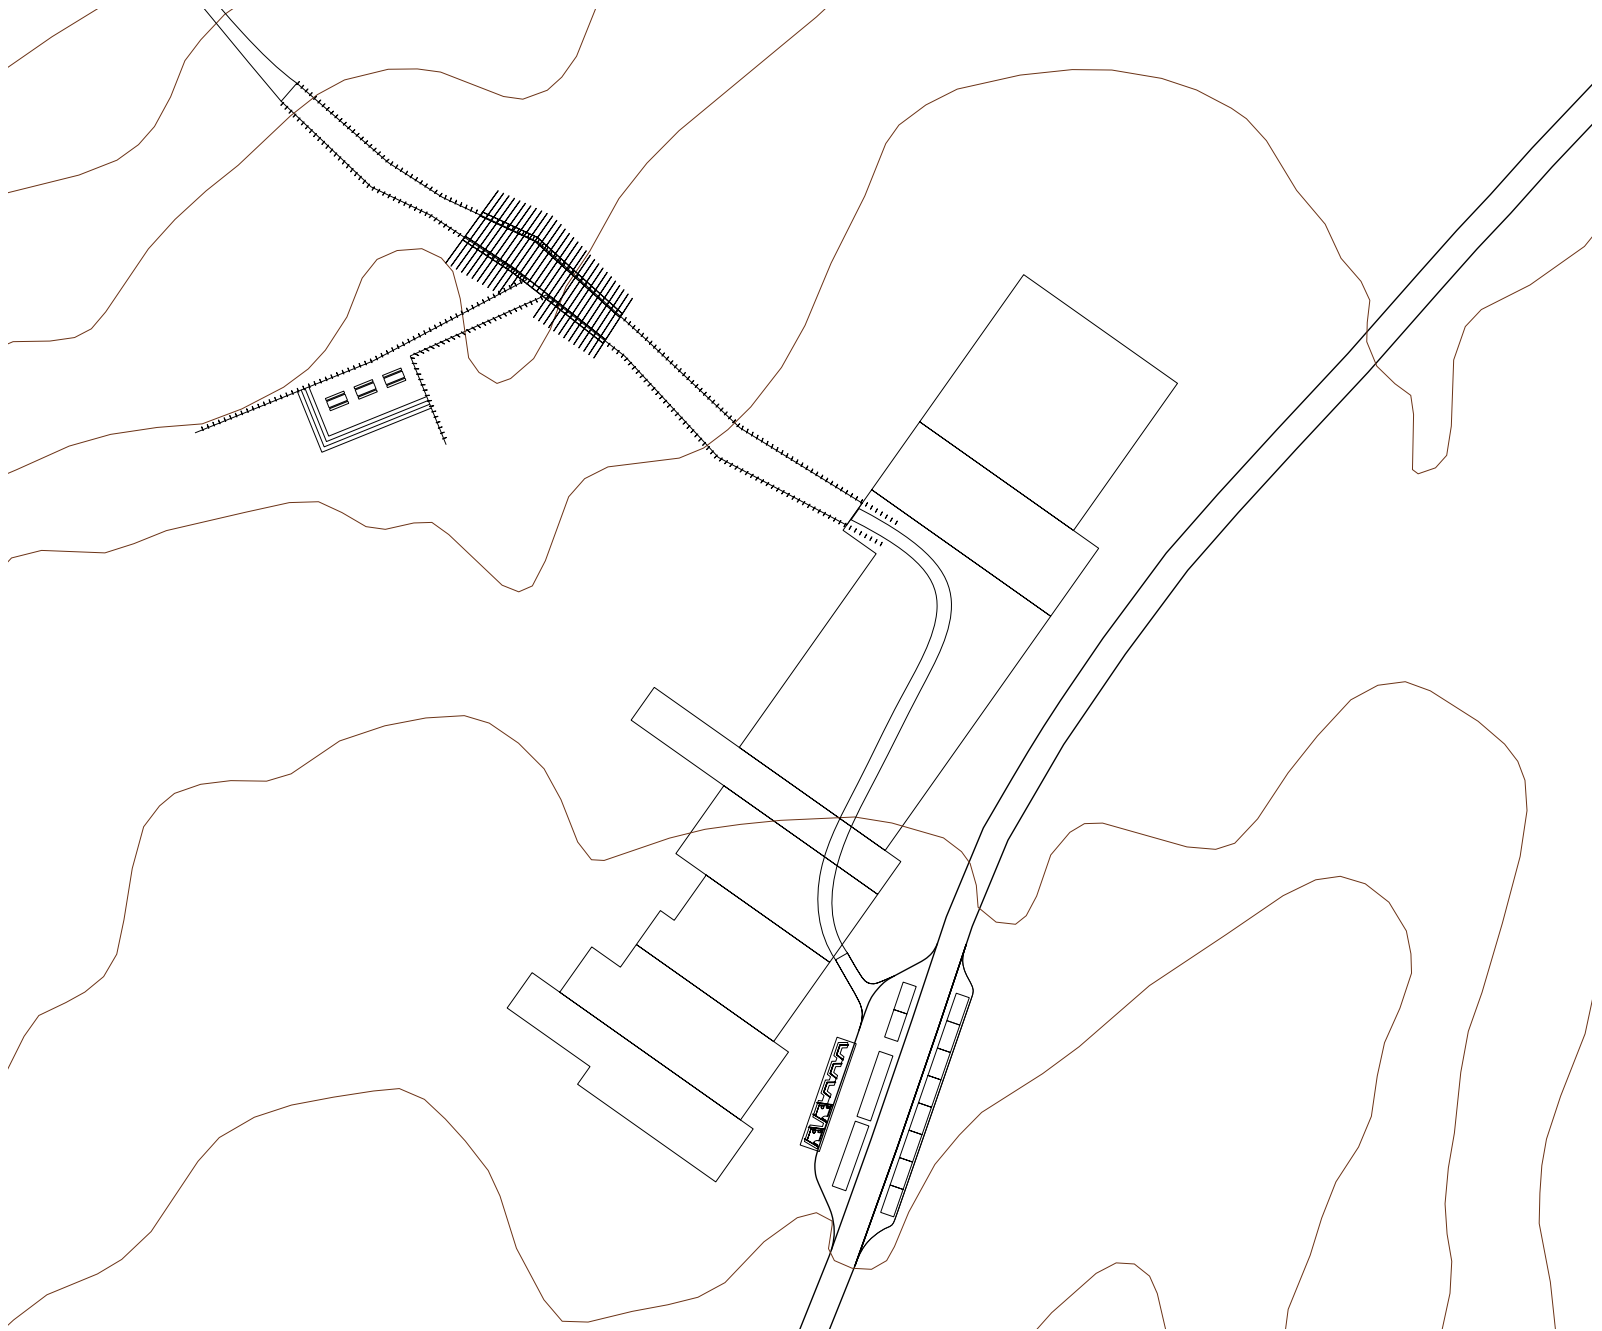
Bagtua – Site plan: service building, parking area, existing peat cuts, and canyon.
